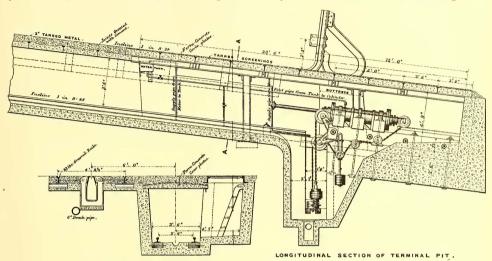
CROSS SECTION OF TRACK AND LONGITUDINAL SECTION OF TERMINAL PIT
